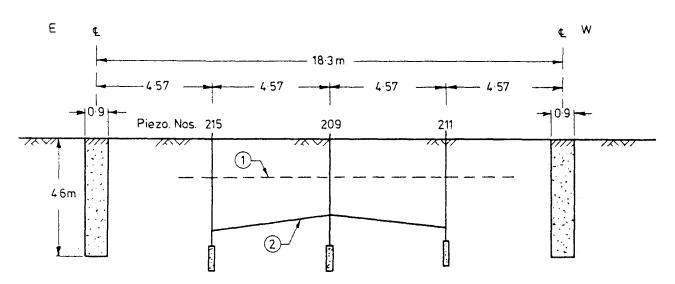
Cross-section of counterfort drain installation at Sevenoaks, Kent, showing the effect of drainage (after Weeks, 1969, 1970). Note. In this paper all such cross-sections are drawn looking downslope. (1) Approximate piezometric level before drainage. (2) Piezometric levels after drainage.
